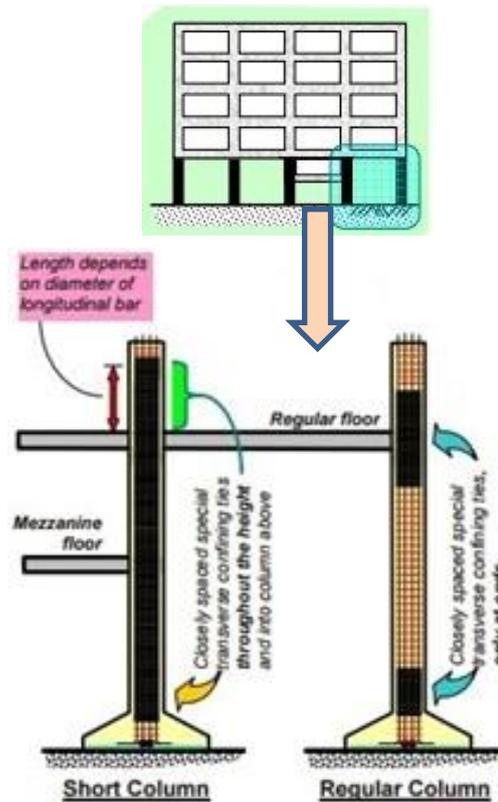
Detailing of sectional reinforcement of RC short columns [4].
